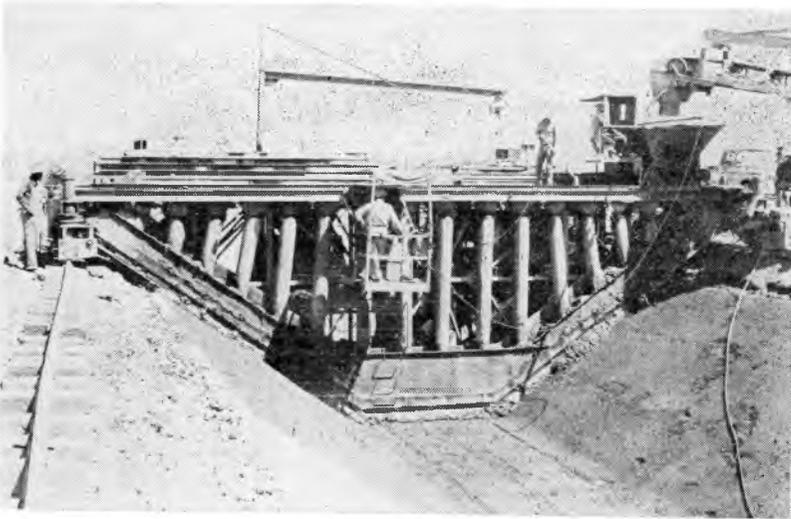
Slip-form used in placing three-in. thick concrete lining of large canal. Concrete must be on dry side to prevent sloughing on side slopes.
